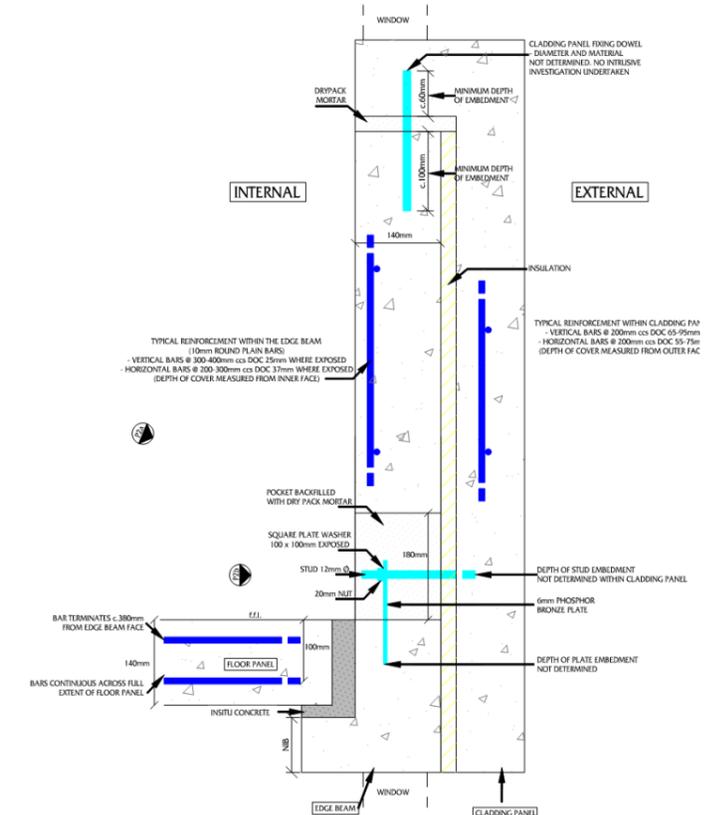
connection of façade panel to edge beam (from GBG report)
